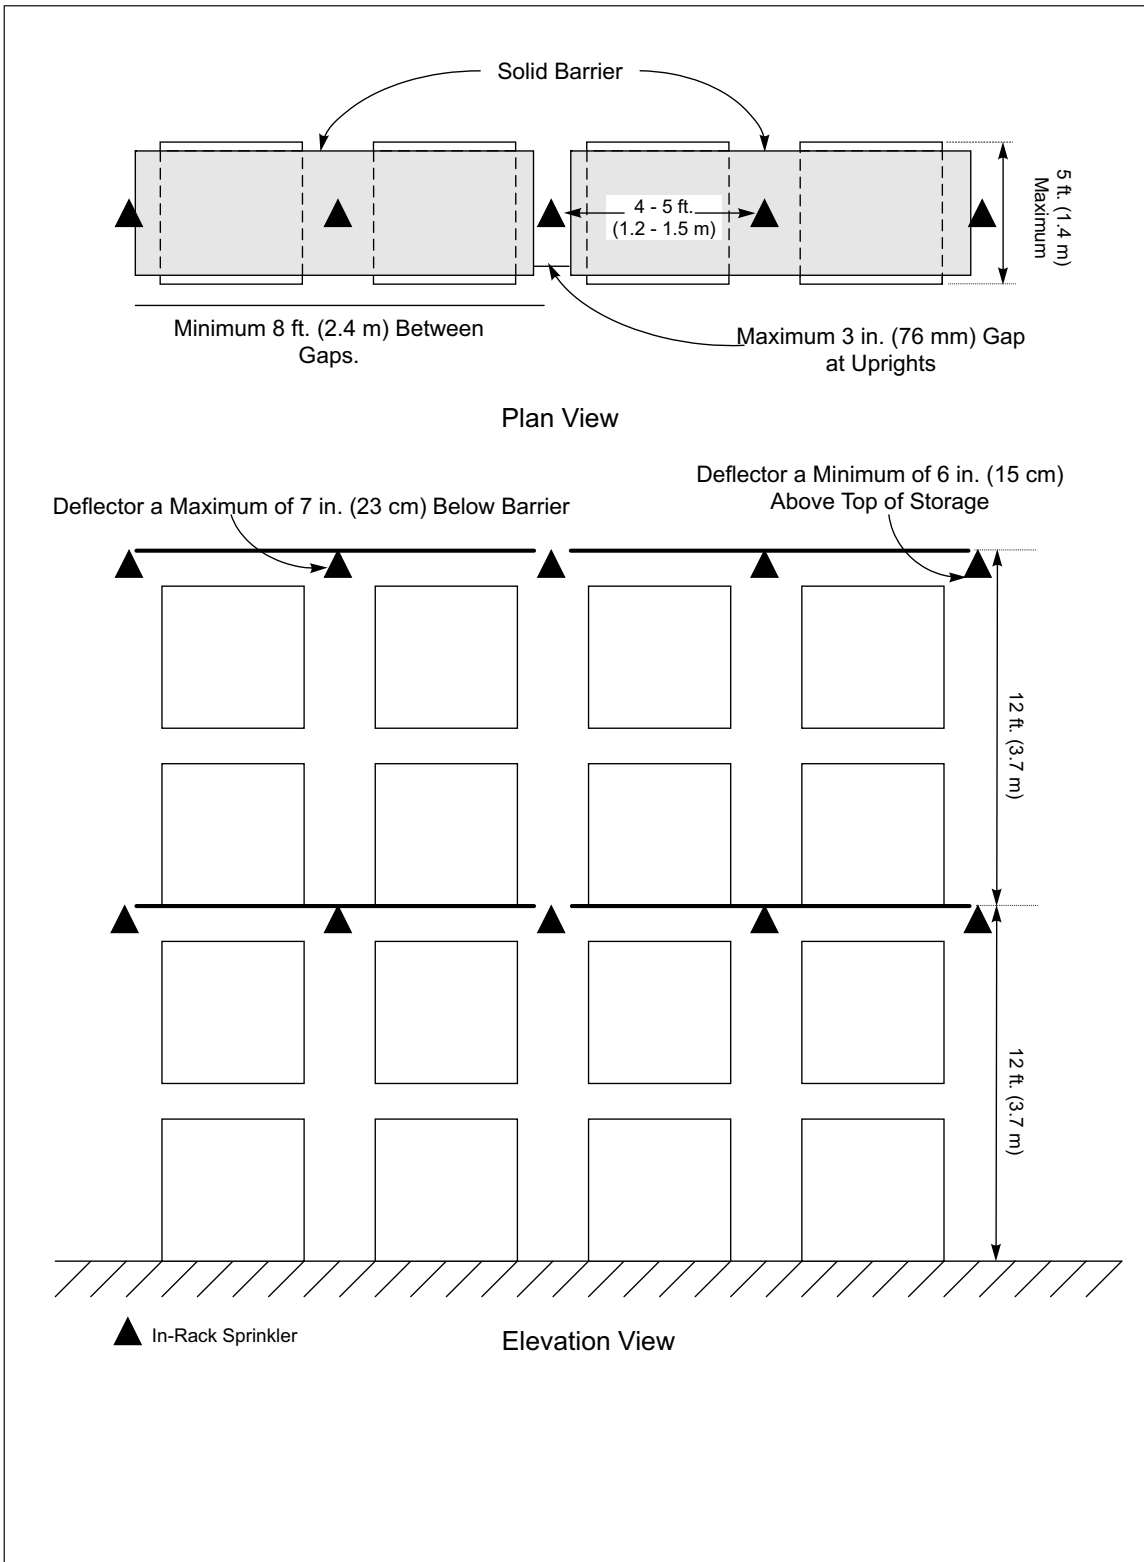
Single row rack in-rack sprinkler layout — Fire Protection Scheme A
